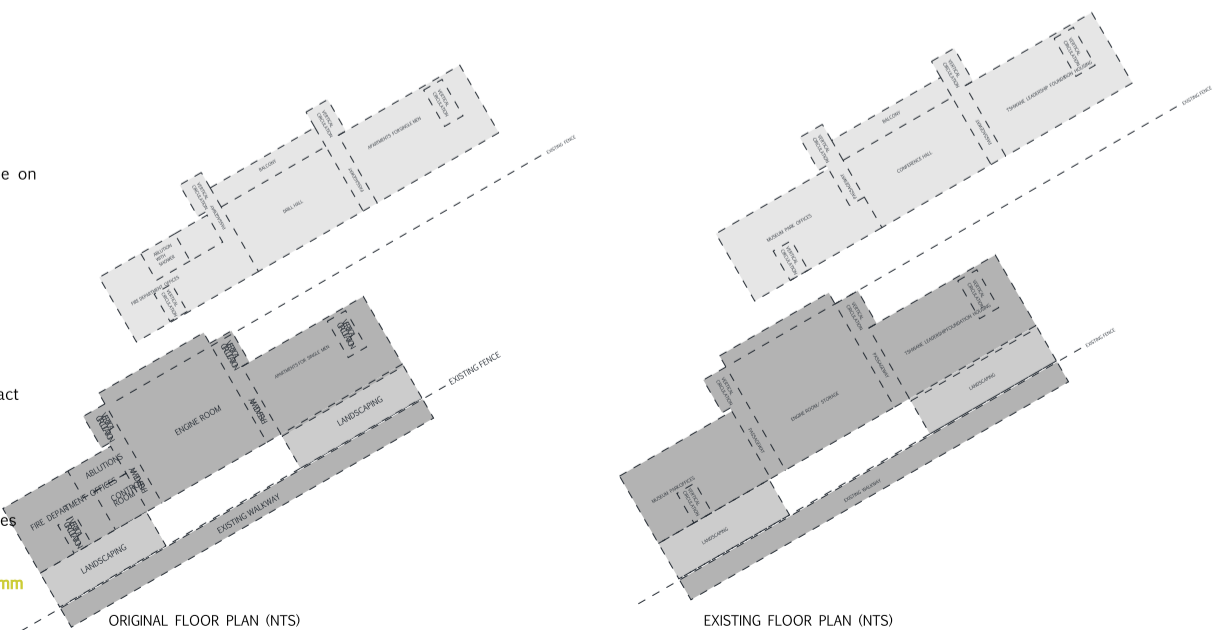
Original and existing uses within the proposed building for intervention (Author 2015)
